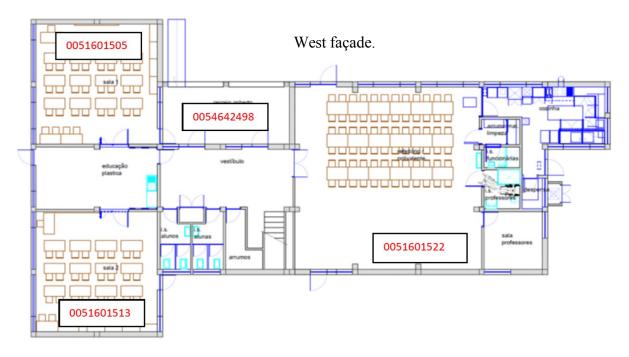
Location of sensors on the first floor of the building, including the exterior sensor on the west façade.
